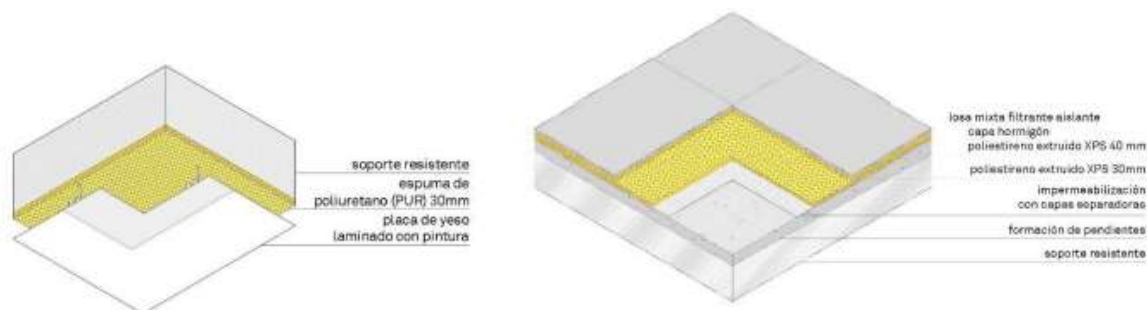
rAE_01 & rAE_02 Floor and roof external insulation
